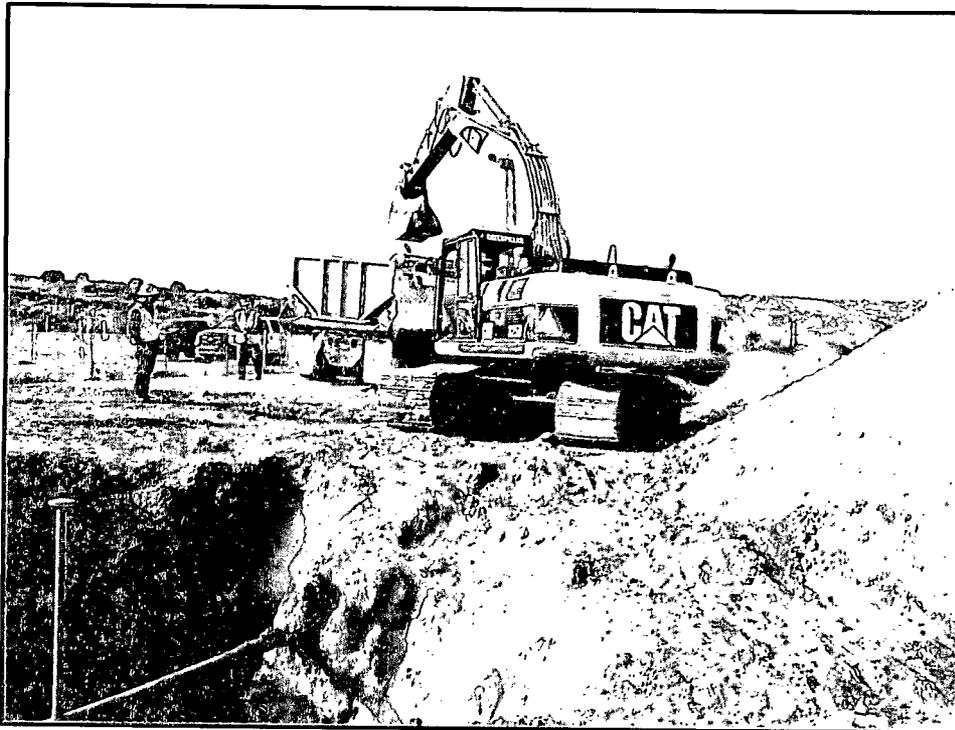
Photo of the excavated soils being exported from the Santa Rosa 8 #2 pipeline release site.
